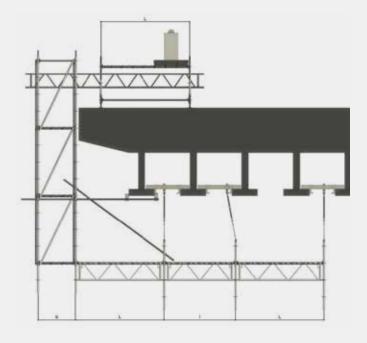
Section view of an example of anchoring using tubes and couplers. The suspended scaffold is braced and anchored to the standing scaffold and bridge girders with a counterweight on the bridge deck.
